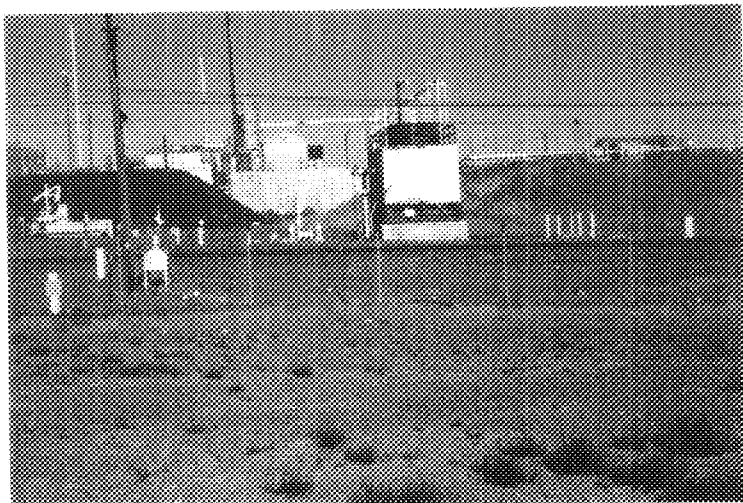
Looking west to Canyon Ave. at location of junction with alternatives 1, 2 and 2A north access roads.
